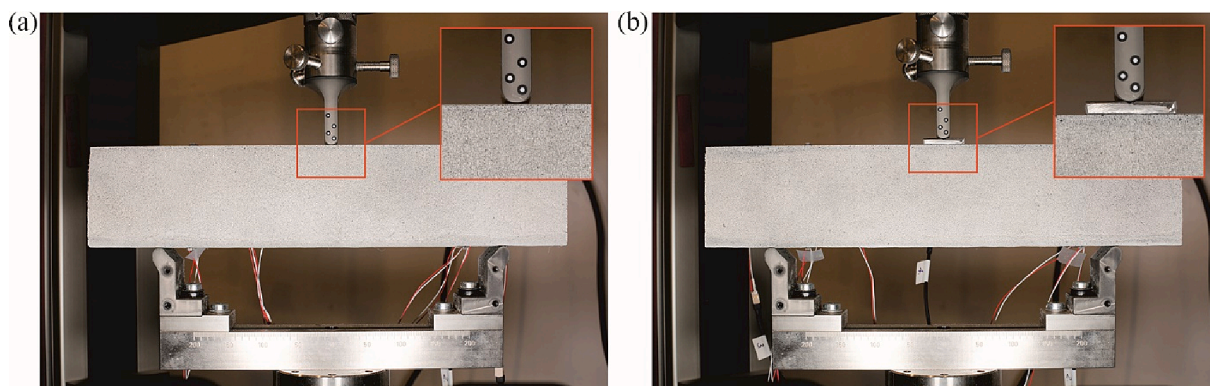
Beam loaded by: (a) line load (Beams #1-SD, #3-HD) (b) surface load (Beams #2-SI, #4-HI).
